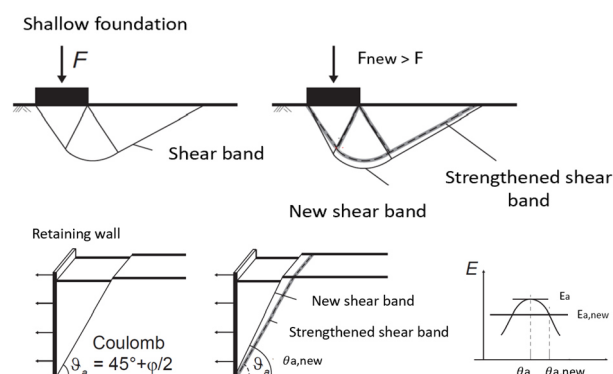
Principle of new shear band formation after strengthening of most likely shear band for a shallow foundation (above) and a retaining wall (below).
